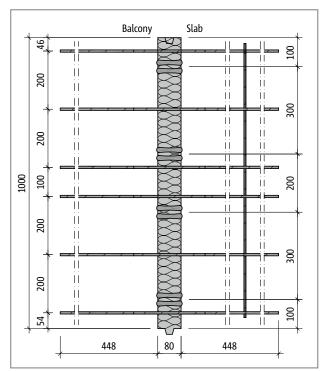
Schöck Isokorb® T type Q-V1: Product layout
